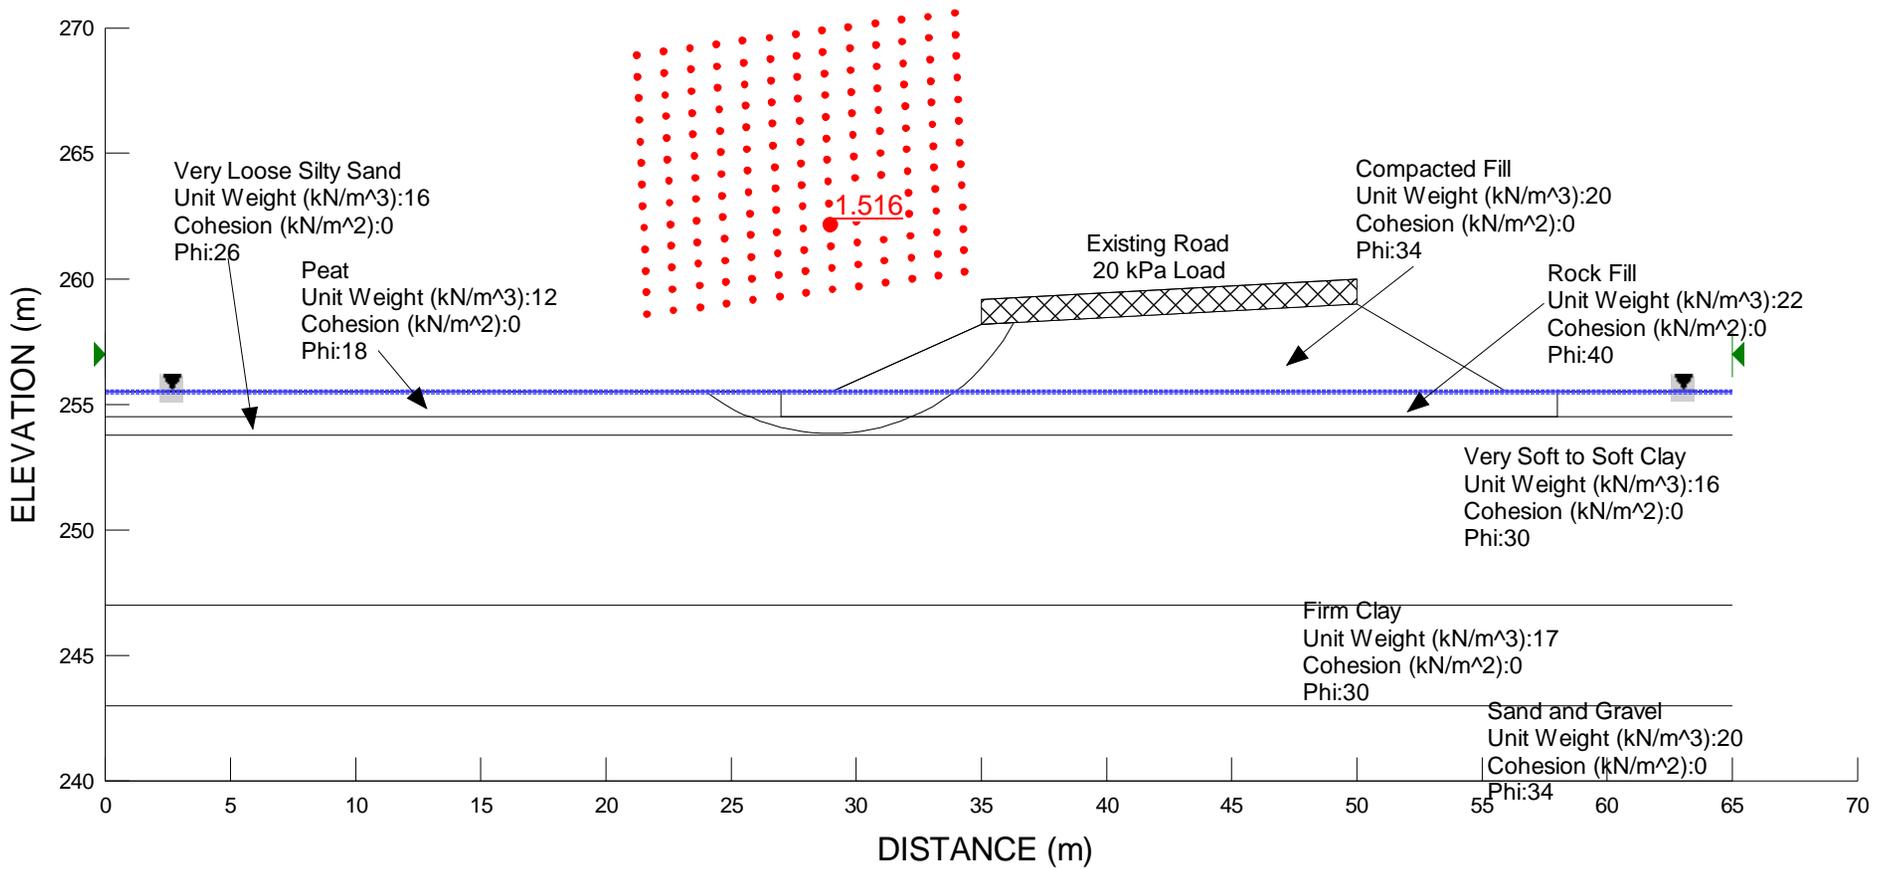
Slope Stability Analysis of Section at Station 19+100 with 3.0 m Road Widening (End of Construction - Shallow Slip Surface)
